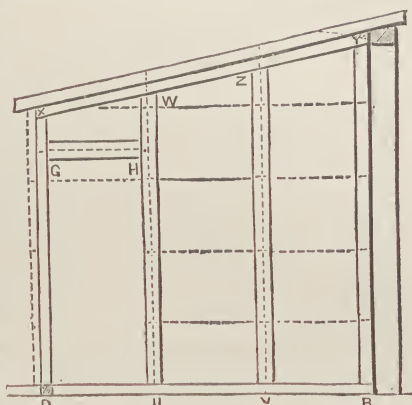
RIGHT END OF CONCRETE SLAB BUILDING.
